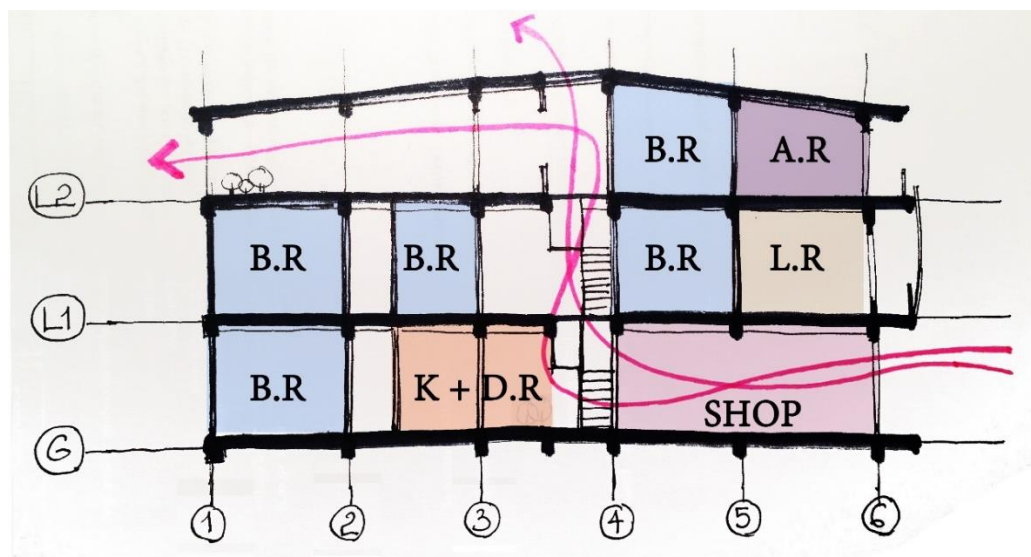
Section of a shophouse on Hung Vuong Street, A1
